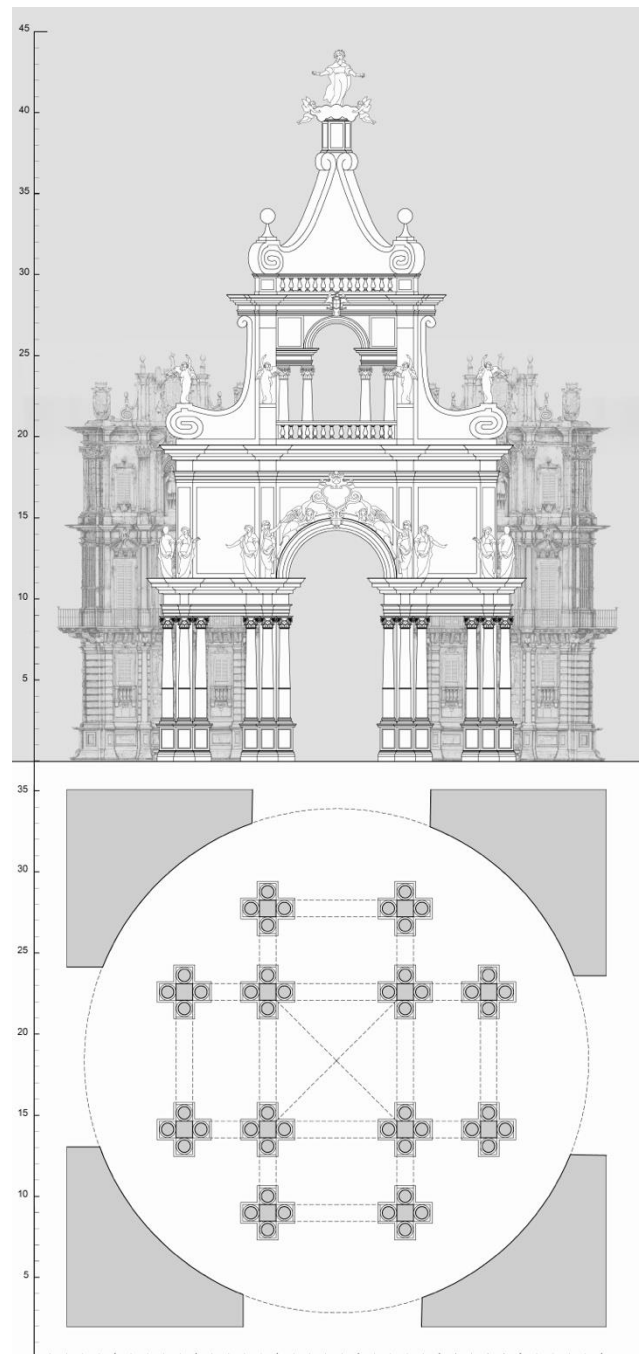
Reconstruction of the *Arco ai Quattro Canti* in plan and elevation (Drawing of F. Colonnese).
